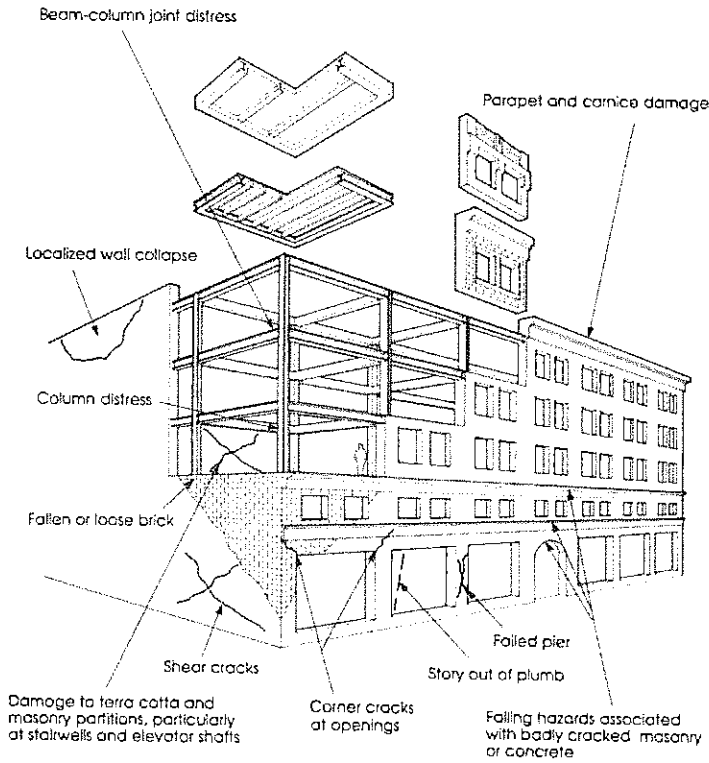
Inspection points for older steel-frame buildings. New steel-frame buildings often have cladding instead of solid masonry or concrete walls as shown above.
